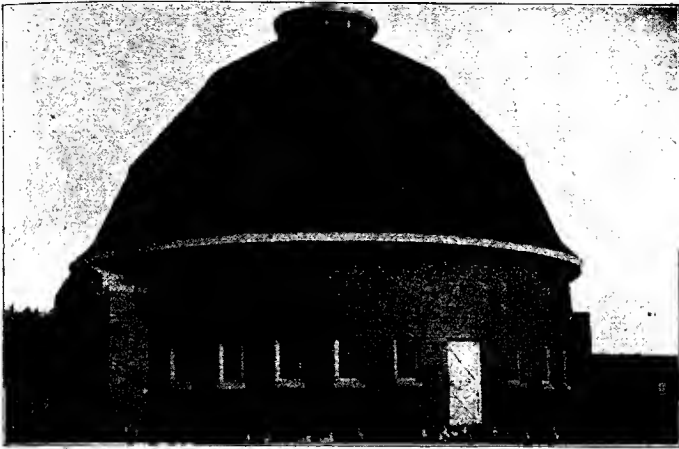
A SUBSTANTIAL, WELL-PROPORTIONED ROUND BARN, WITH THE FIRST STORY BUILT OF BRICK
